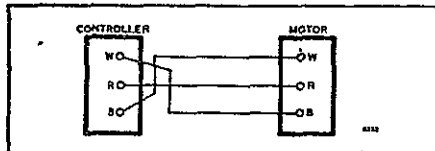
Typical modulating motor-controller wiring hookup for heating application with valve Ports A and B reversed.
